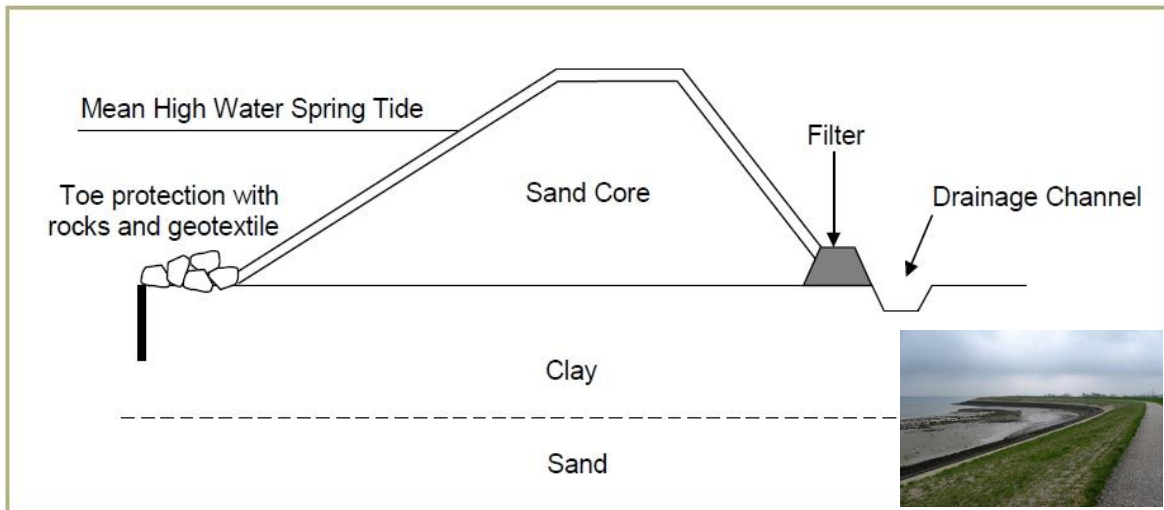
(a) Typical sea dike cross section (Linham and Nicholls, 2010) and (b) typical dutch sea dike photo.
